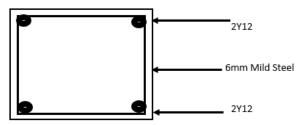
Section A-A for high tensile steel reinforcement concrete beam
